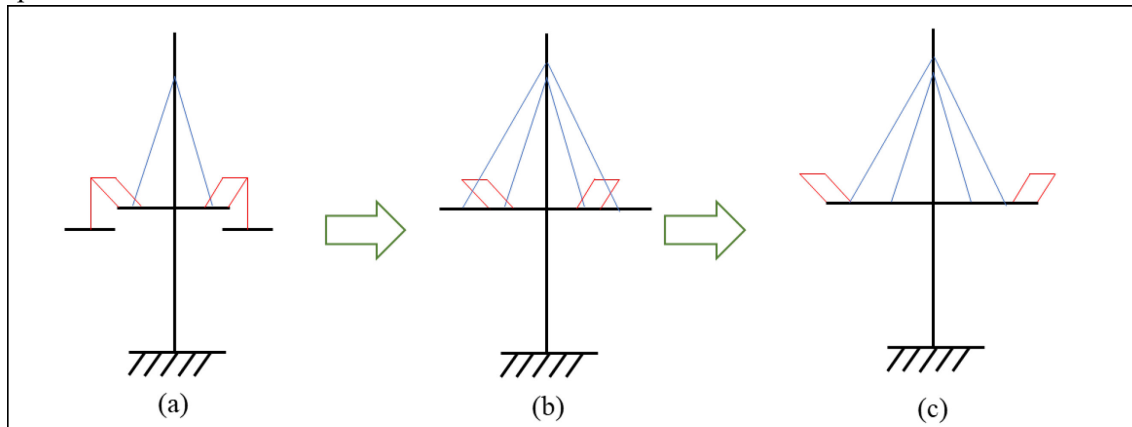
The illustration of the cantilever construction method: (a) installation of a girder segment, (b) installation of the stay cables, (c) movement of the crane
